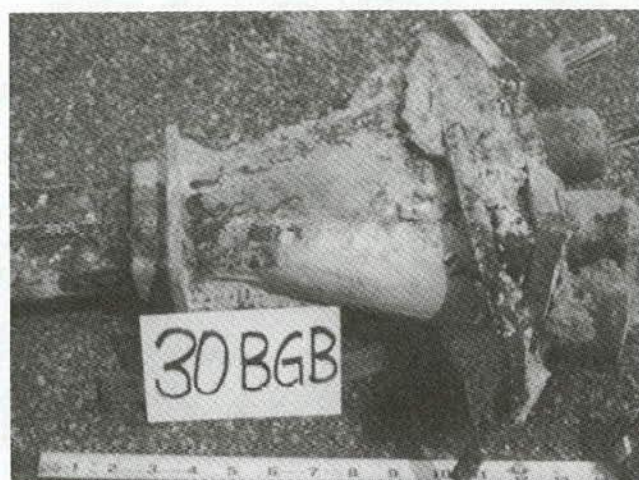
Condition of assembled materials from post-tensioned specimen 30BGB after corrosion tests.
